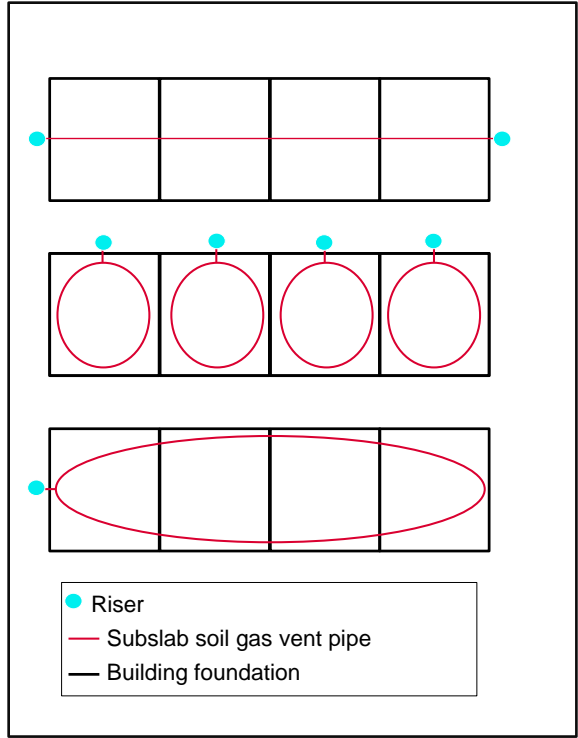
Example of a soil gas collection system using flexible drain pipe.
